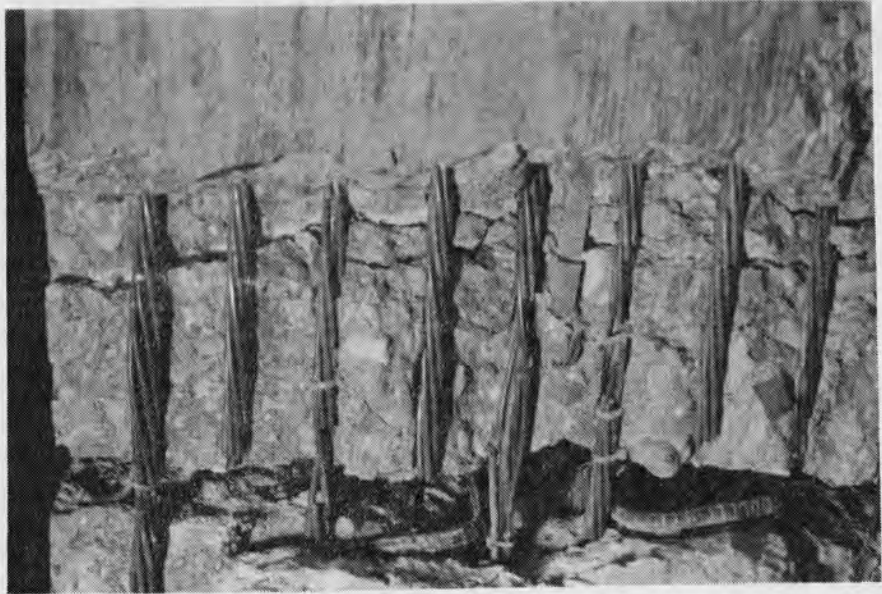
Wire fractures for Specimen C-14-NP-5.5-OL-2.29
